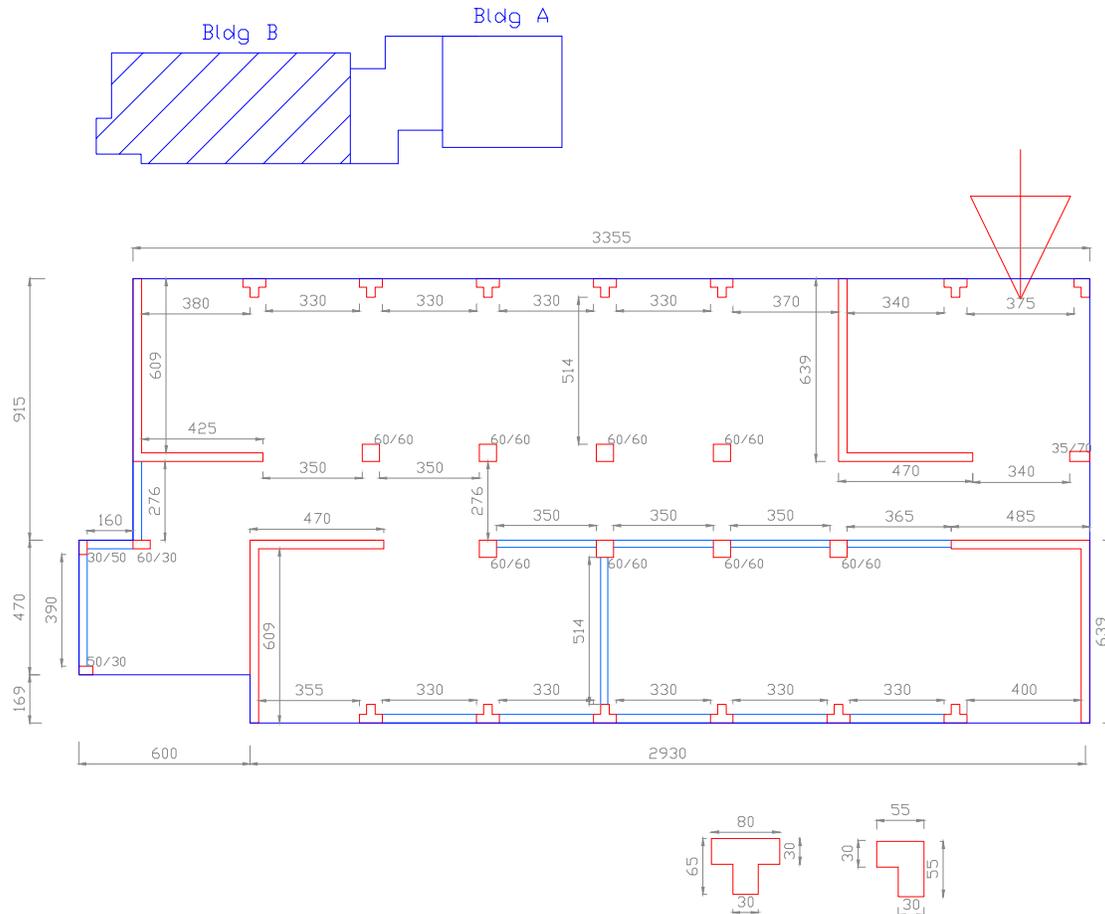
Structural floor plan for building C13-03. The thickness of the shear walls was 0.3m. The masonry wall thickness was 0.25m for the interior walls and 0.3m for the exterior walls. The arrow shows the entrance to the building. Dimensions are in cm.
